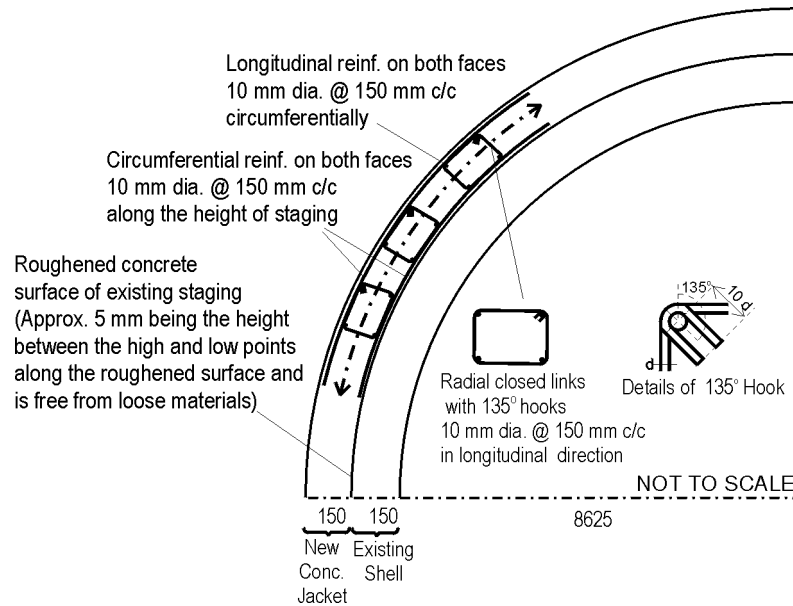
Quarter plan of the retrofitted shaft section and arrangement of reinforcement.
